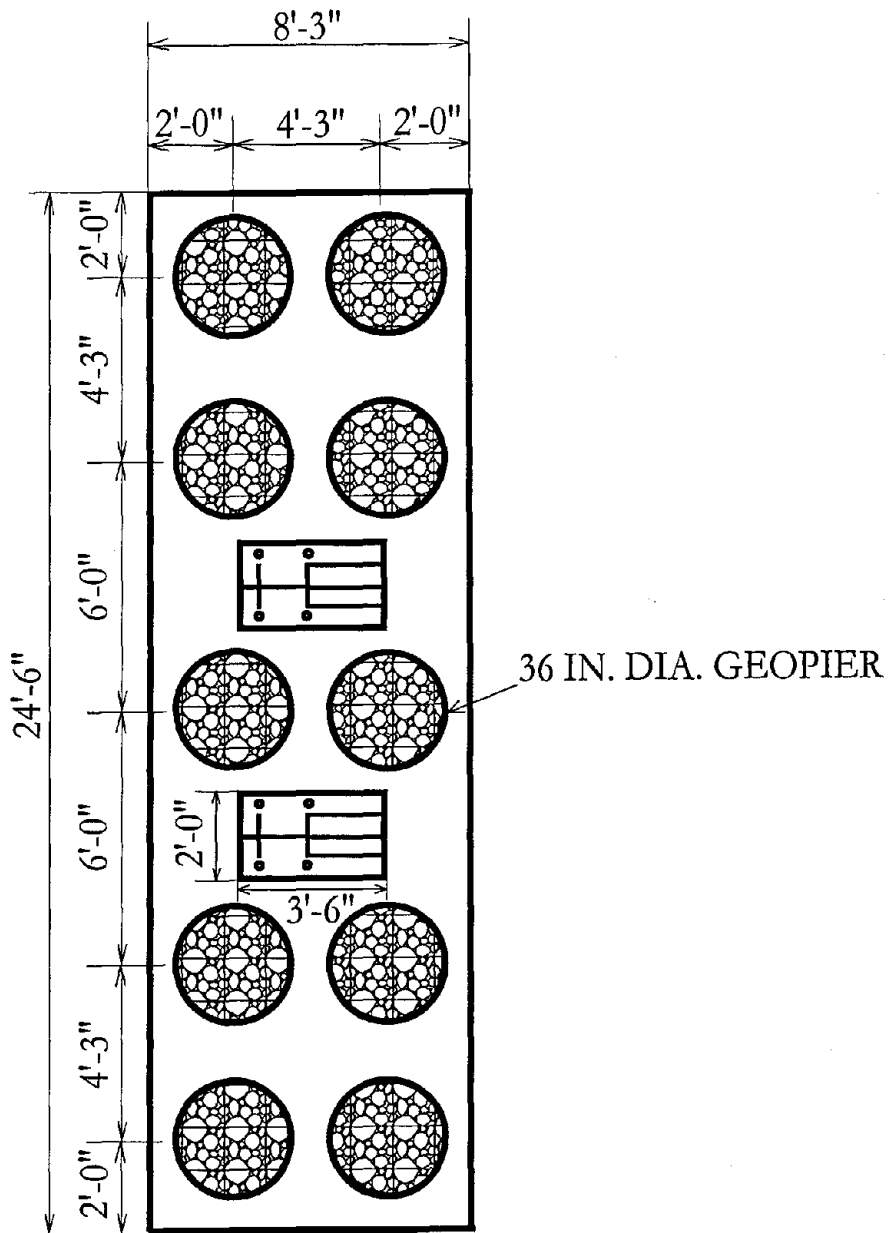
Construction drawing of load frame footing showing location of base plate and ten Geopiers (1'=305 mm, 1"=1 in.=25.4 mm)
